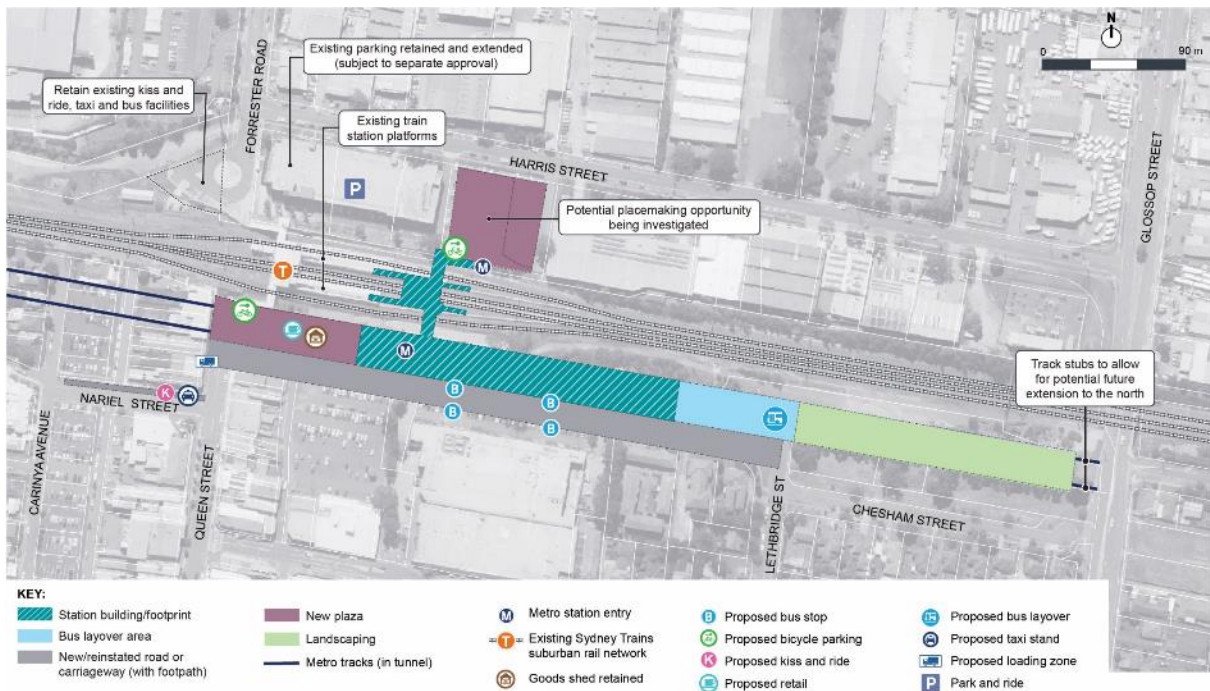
St Marys Station - Indicative layout and key design elements
